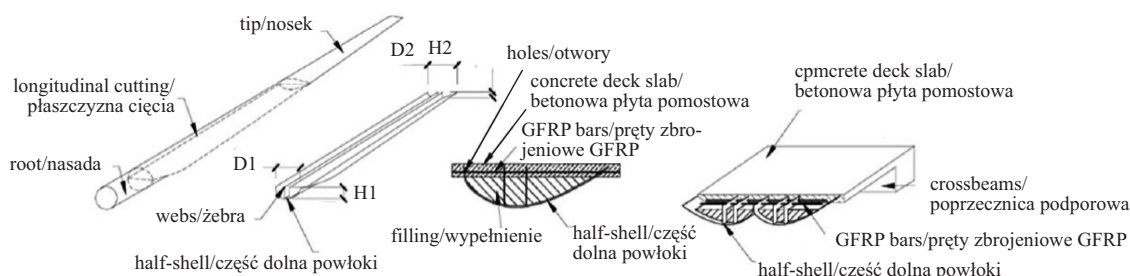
Concept of a hybrid span made of LM 29.1 type girders
